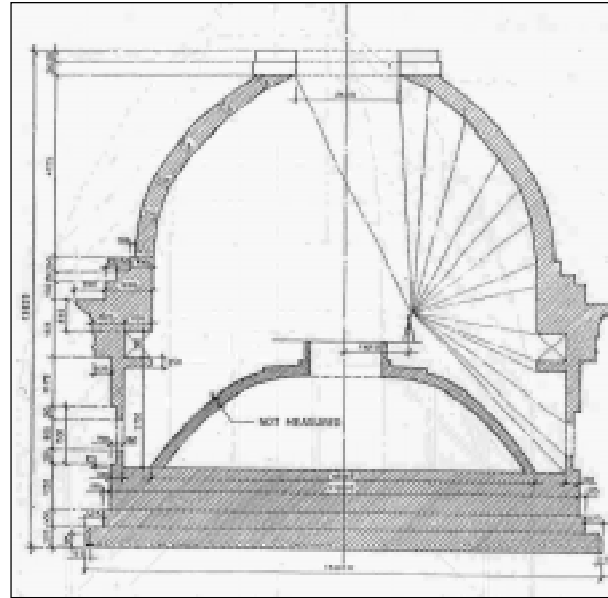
Sectional Elevation of the Octagonal Outer Dome of Church
